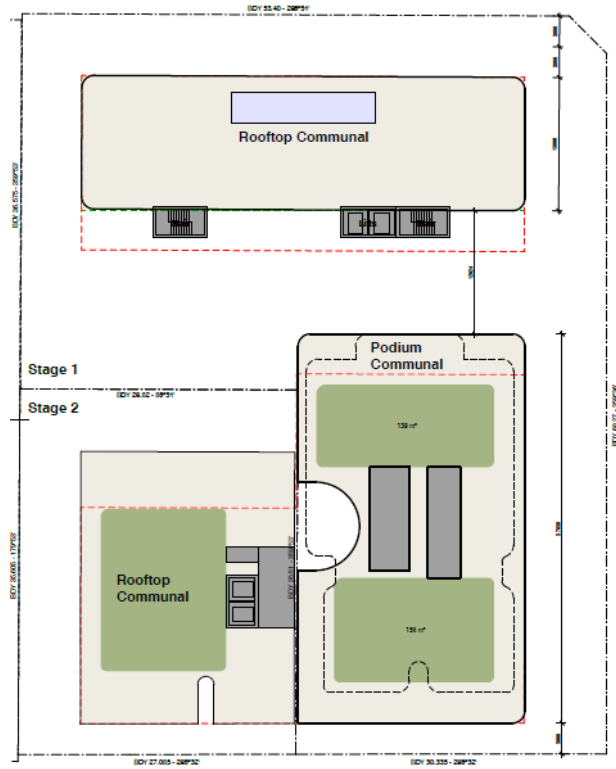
Proposed level 5 floor plan (Indicative Design Concept)
